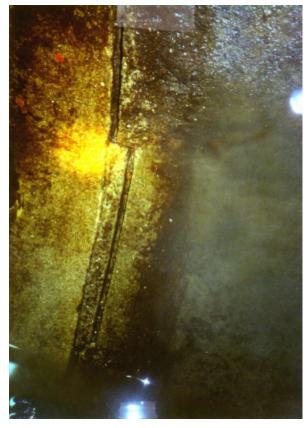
Deteriorated concrete grout in joint of 42" P.L. - typical.
